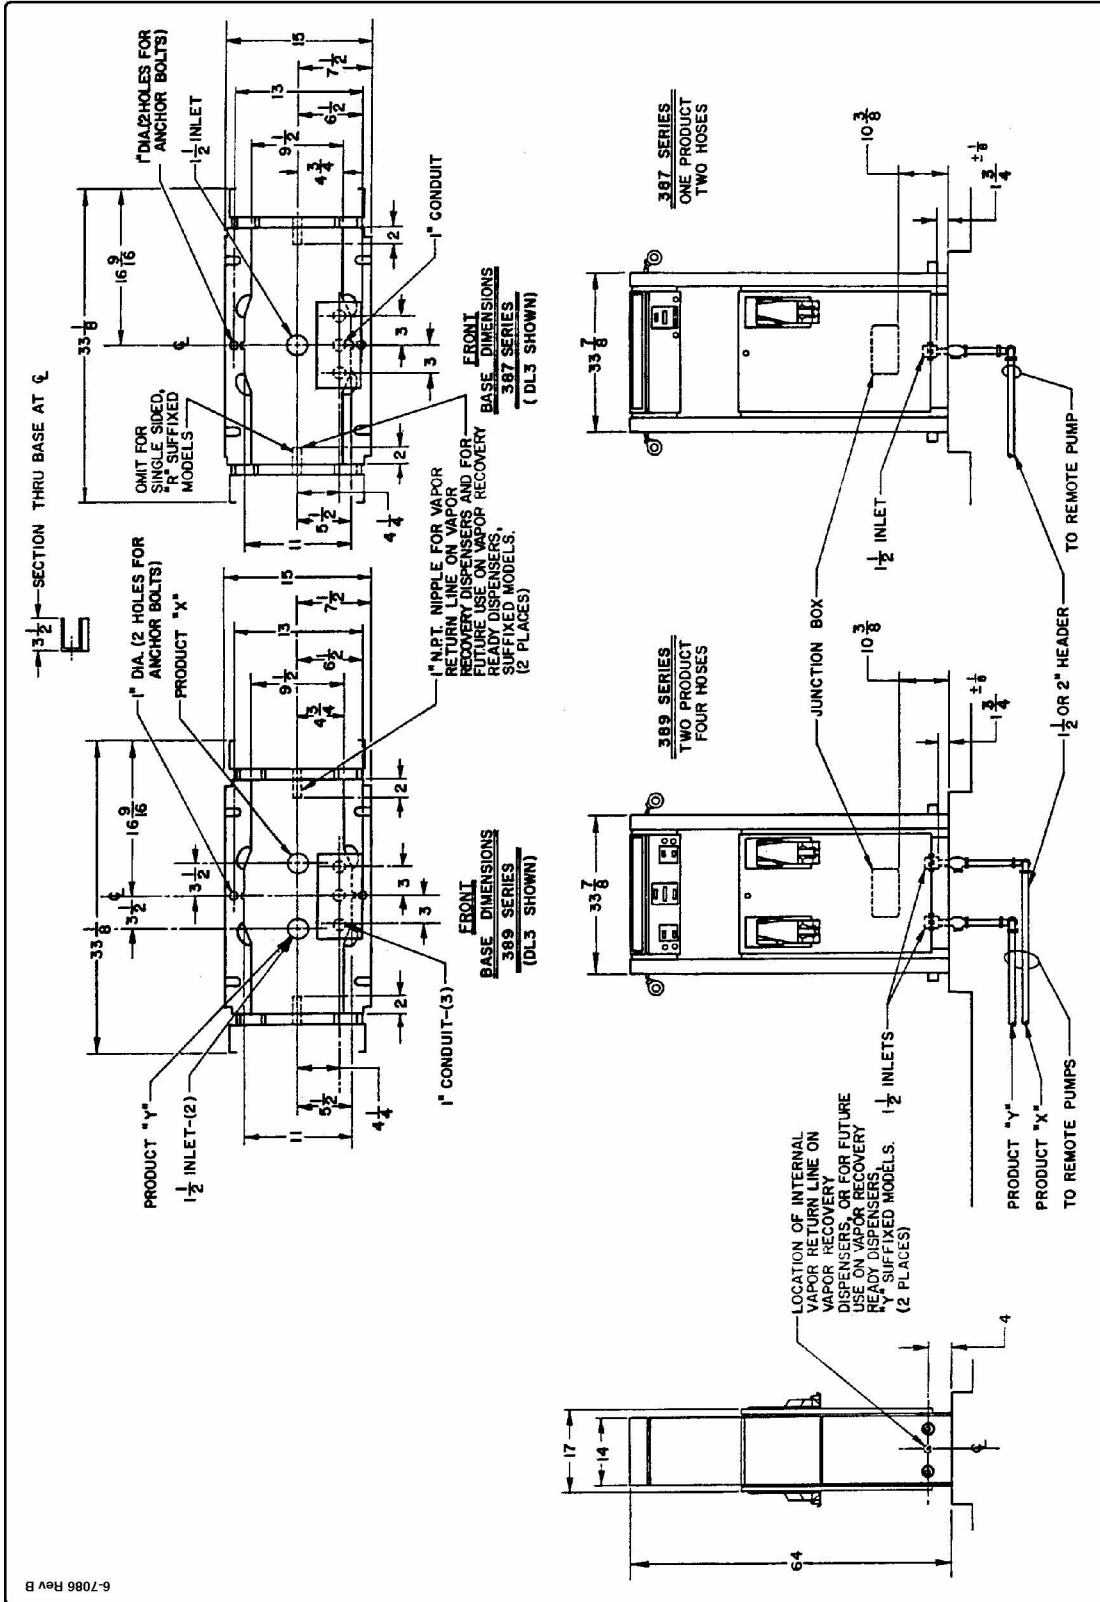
6-7086 INSTALLATION INSTRUCTION - 387, 389 REMOTE DISPENSERS.
